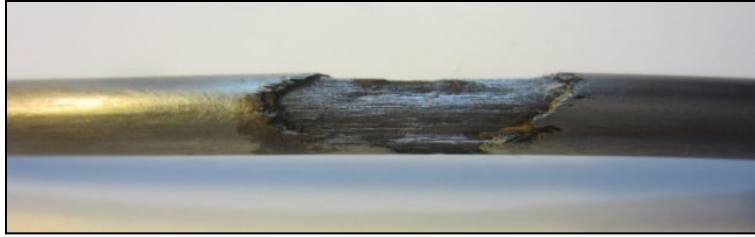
Photos. Pitting corrosion on two outer wires.⁽⁷²⁾
